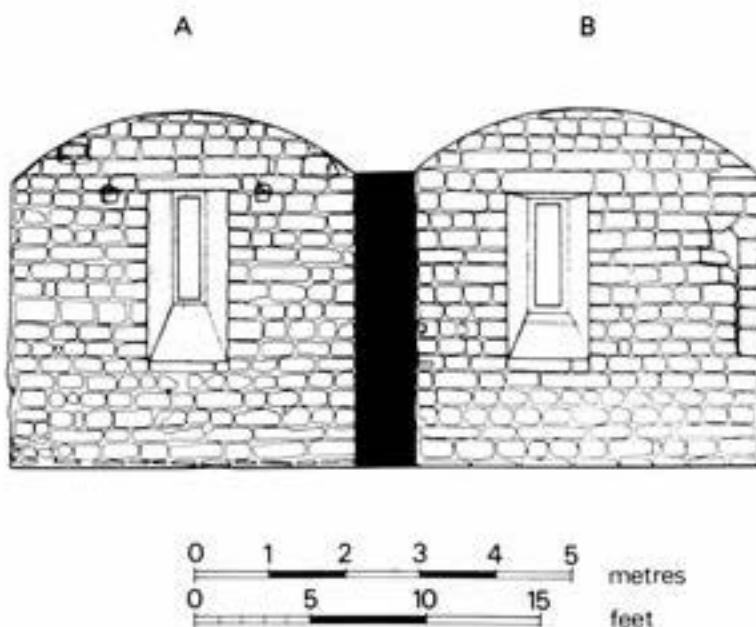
Elevation of the north wall on the third floor (room 25 A; room 26 B)
